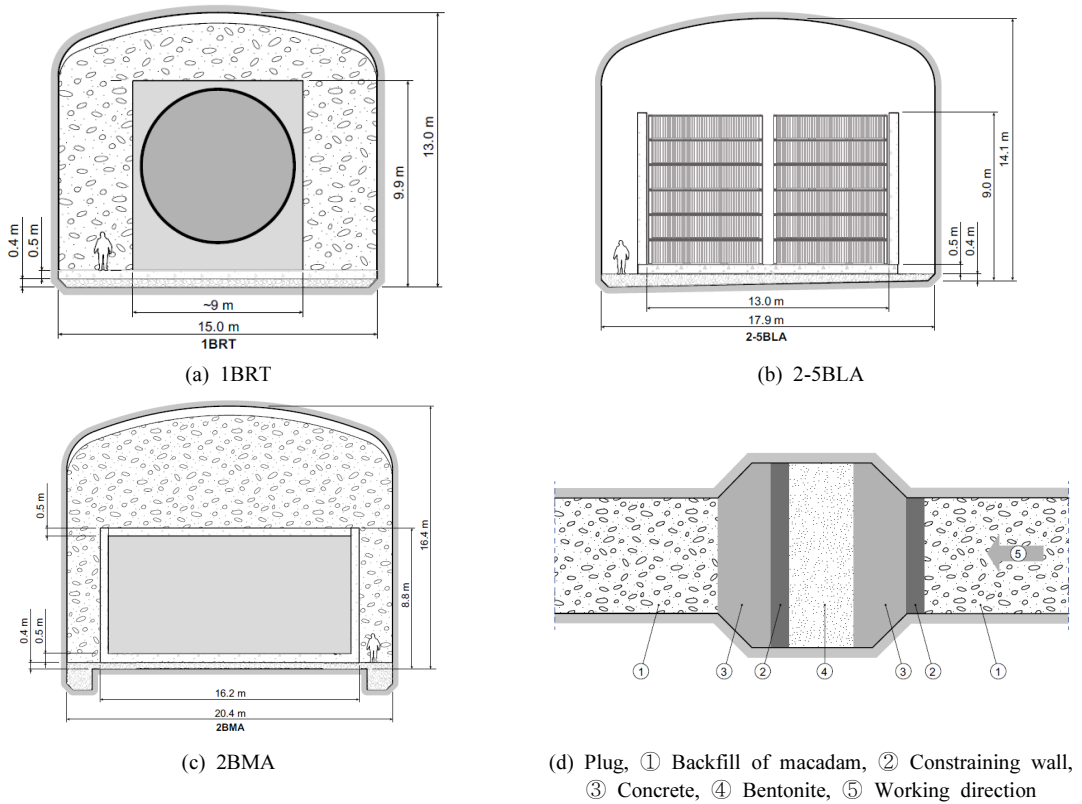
Schematic cross section of SRF3 repository tunnels and plug. (SKB, 2014b)
